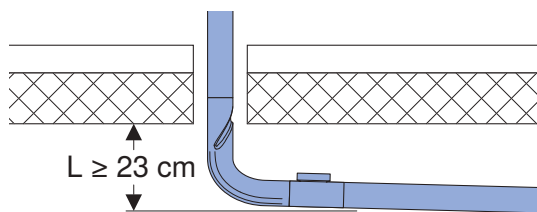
Distance of stack offset from the ceiling when installing a Geberit HDPE access pipe 90°
